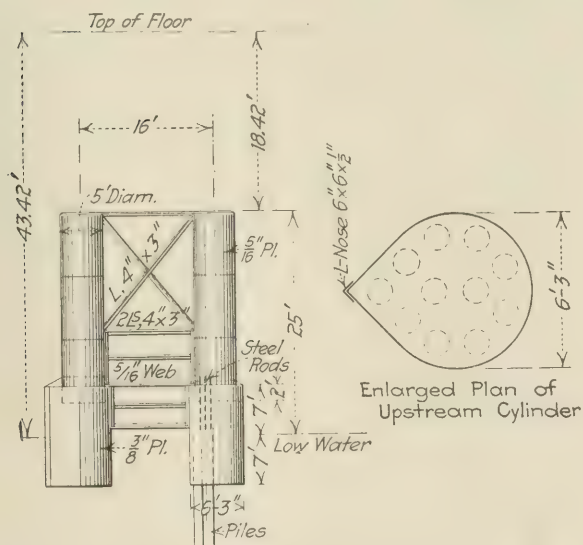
CYLINDER PIERS FOR THE EAST APPROACH
